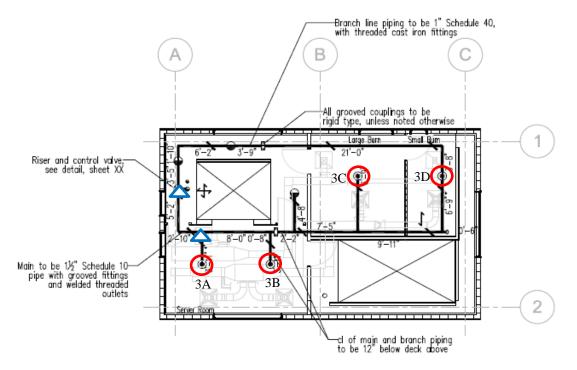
Floor 3 sprinkler system design layout and specifications
